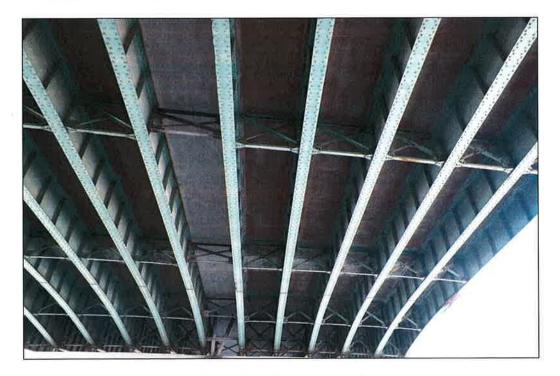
Typical Condition of Soffit (Bent 131-132) (fair condition – stained and unstained cracking, isolated delaminations and spalls, patches and light scaling)
